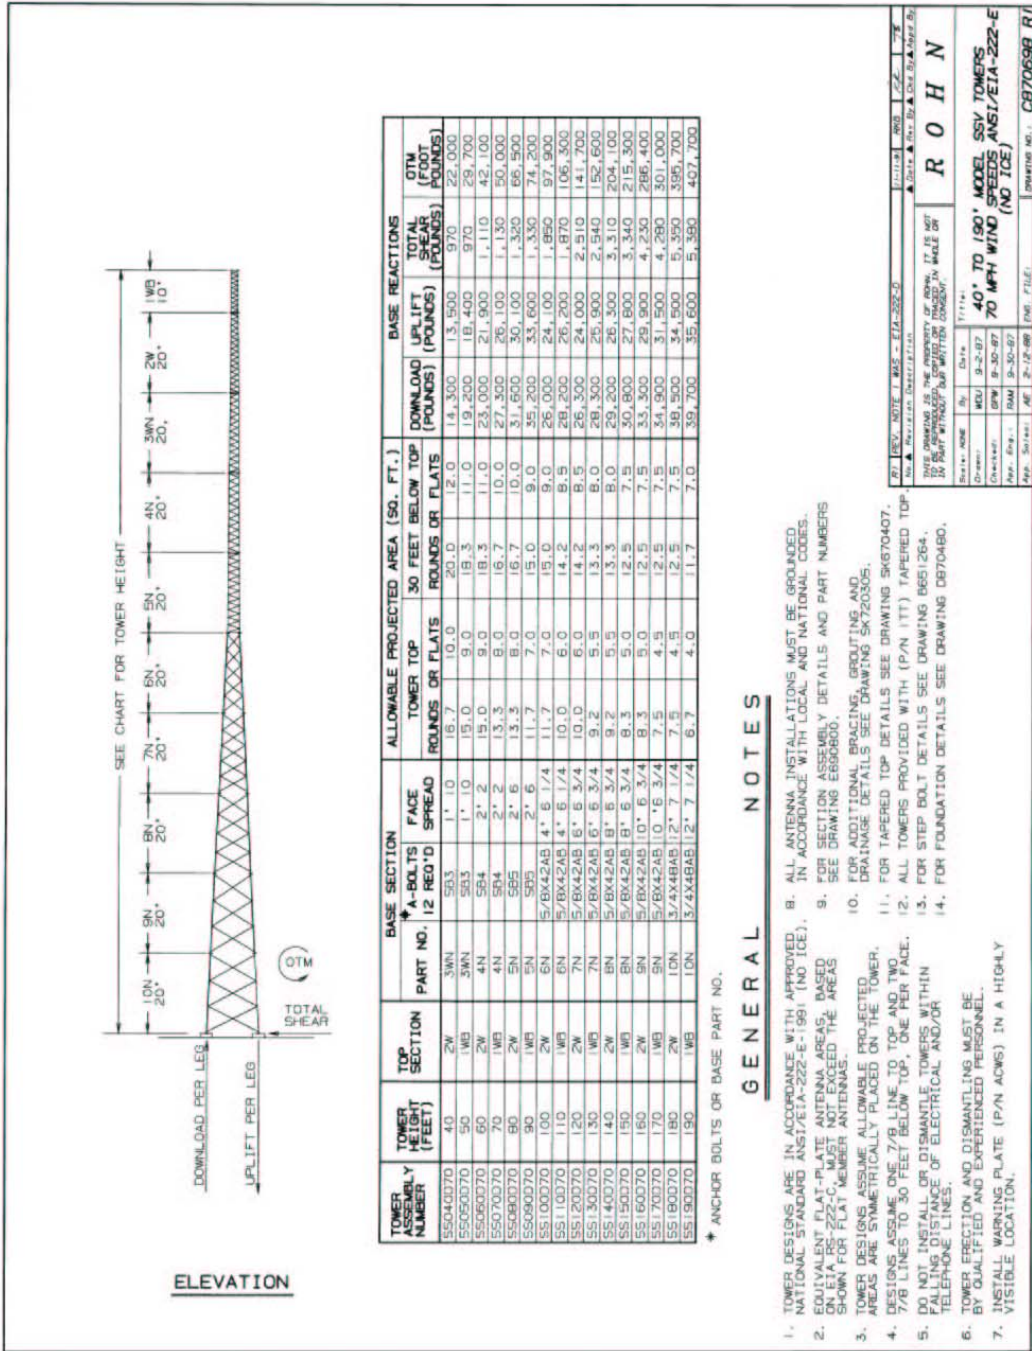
Exhibit O: Rohn Corporation Engineering Drawings for the SSV Series Towers and Foundations
